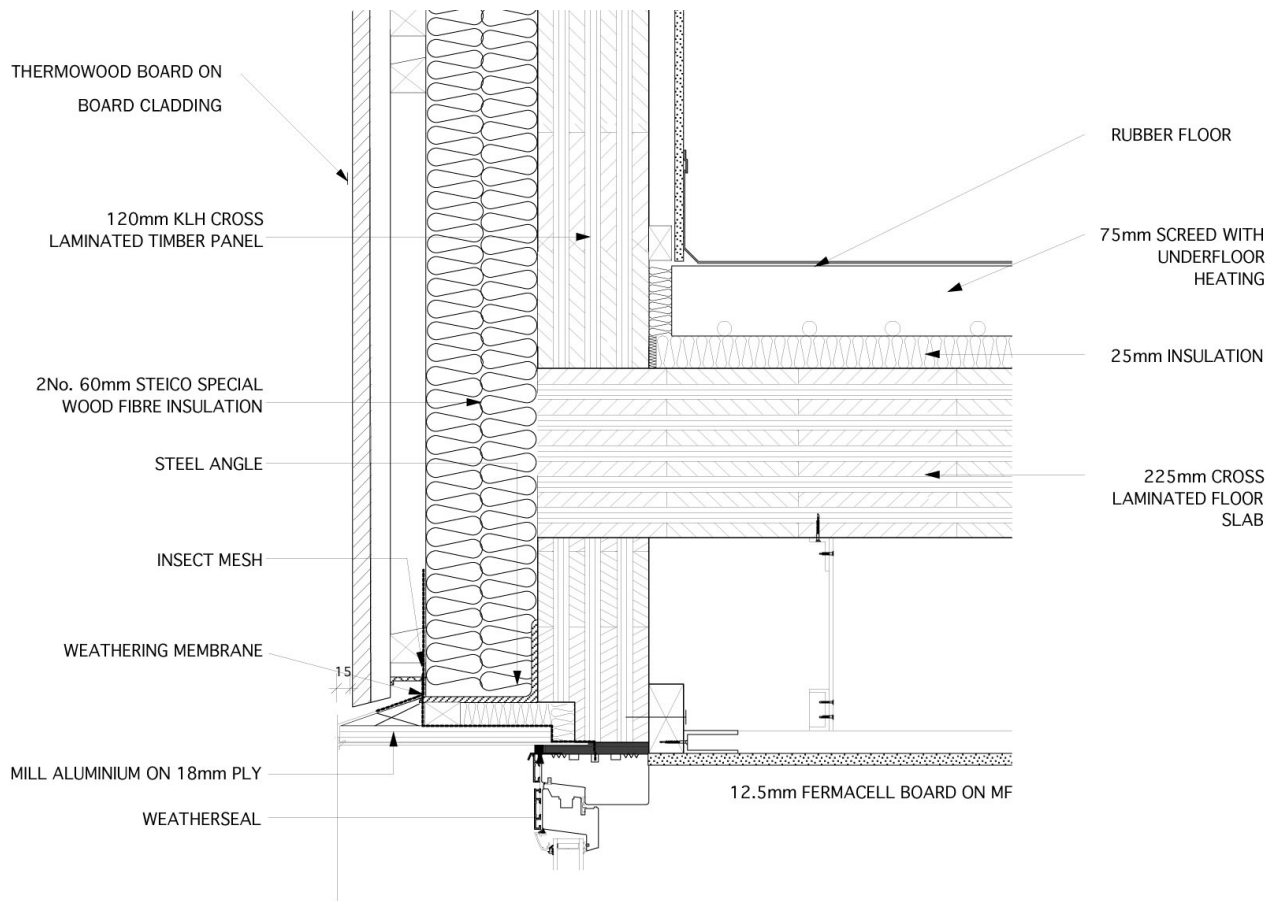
Typical Window and first floor Construction Detail- showing timber cladding, wood fibre insulation, Cross laminated timber structure and window installation.
